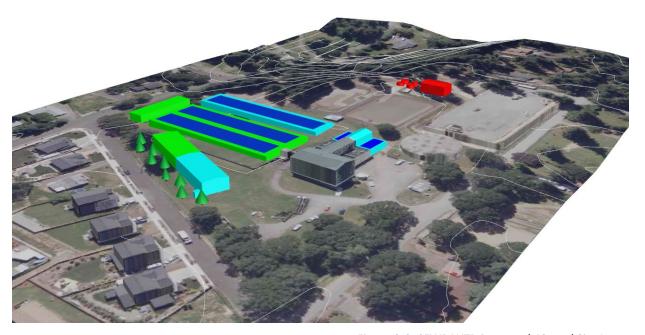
SFWB WTP Proposed 40 mgd Site Layout
